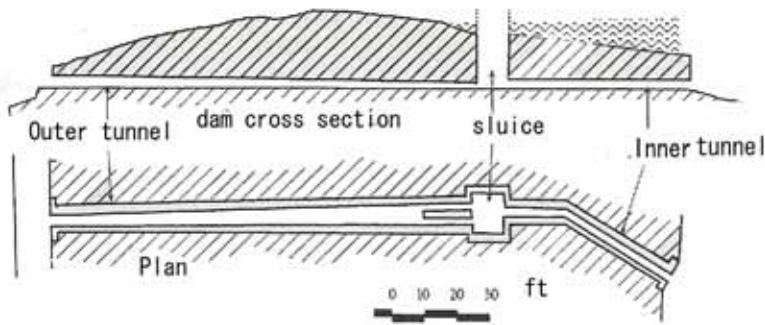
Plan view of Bisokotuwa (source: Udula Bandara Awsadahamy, 2003)
